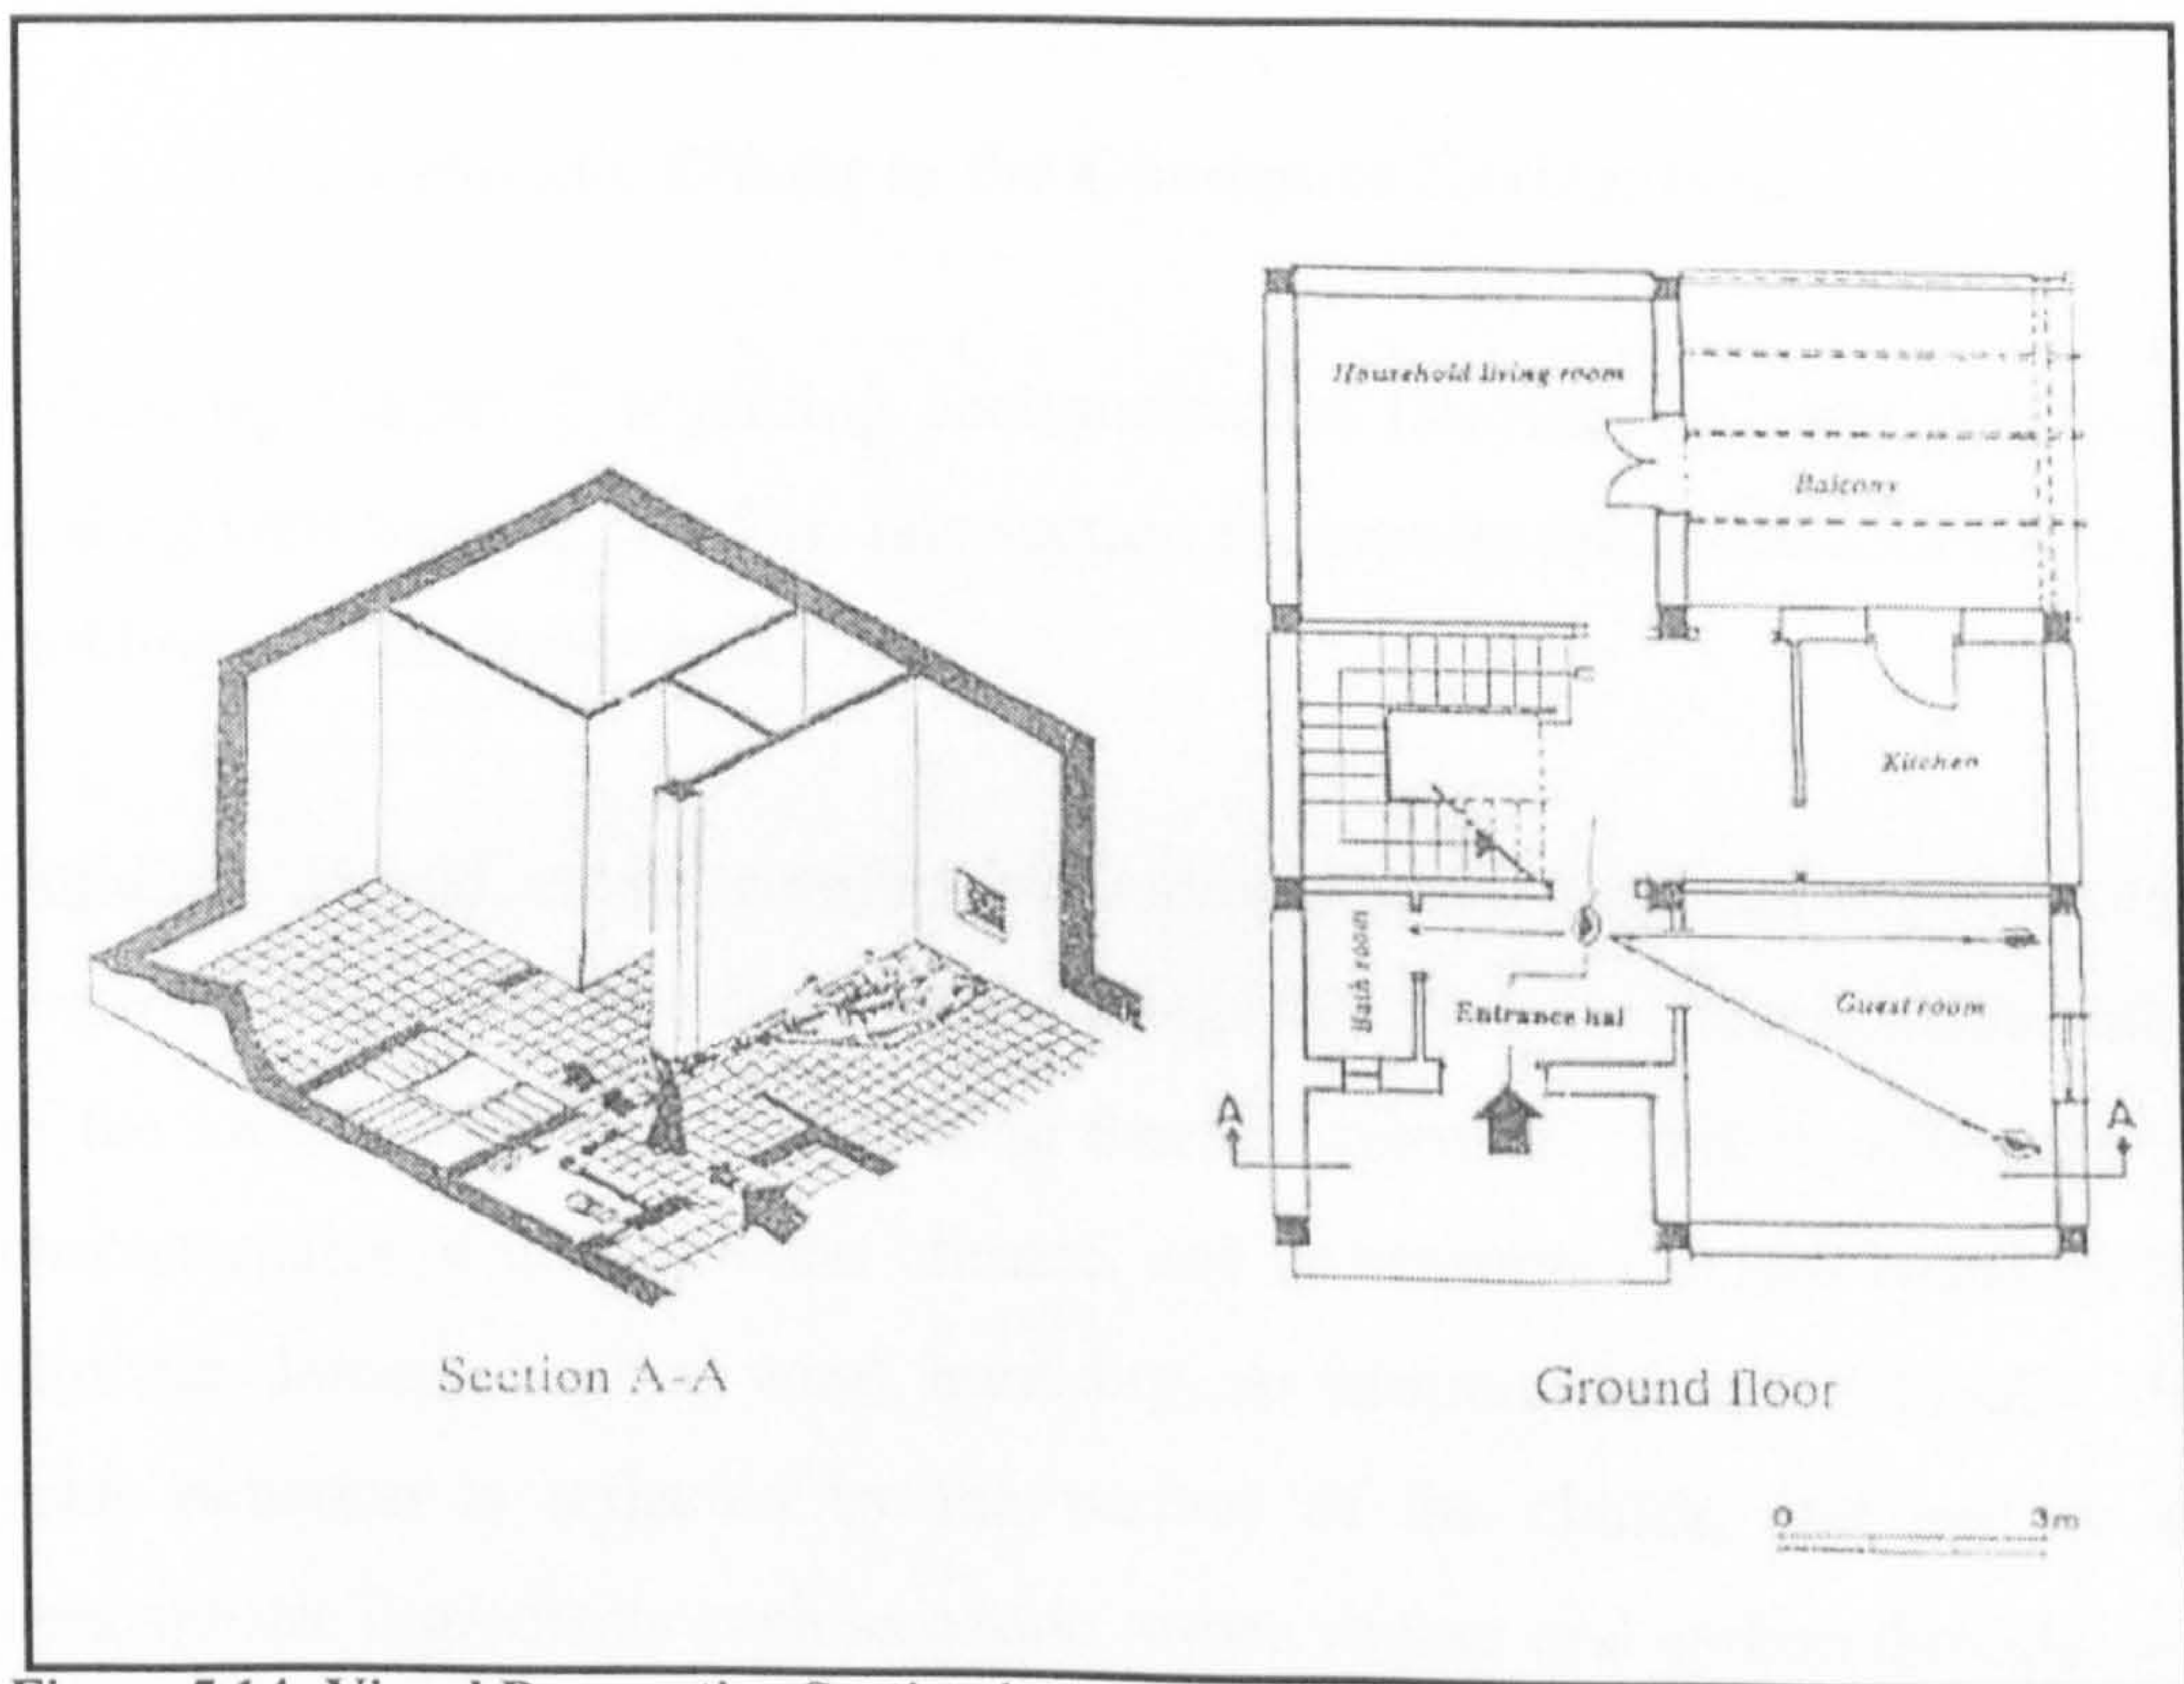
Visual Perspective Section in one example of Contemporary Building in new Town of Ghadames, 1997.
